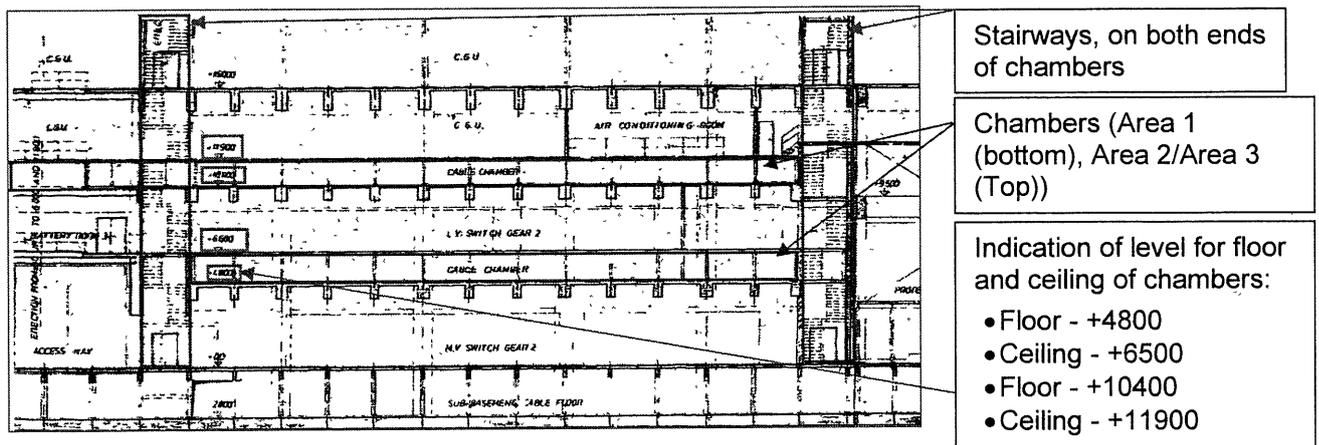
Unit 2 Auxiliary Bay Longitudinal Section (Drawing [13])
